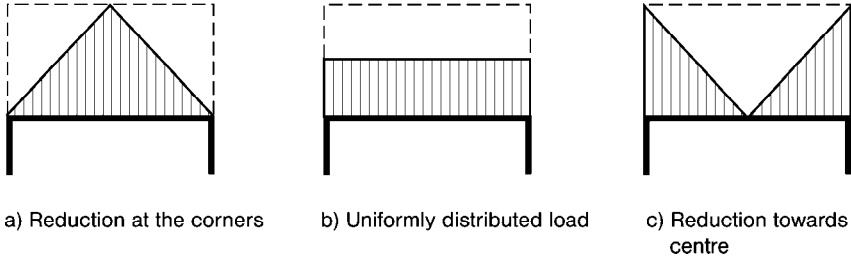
Earth pressure on narrow excavation sides and shaft-like excavations
